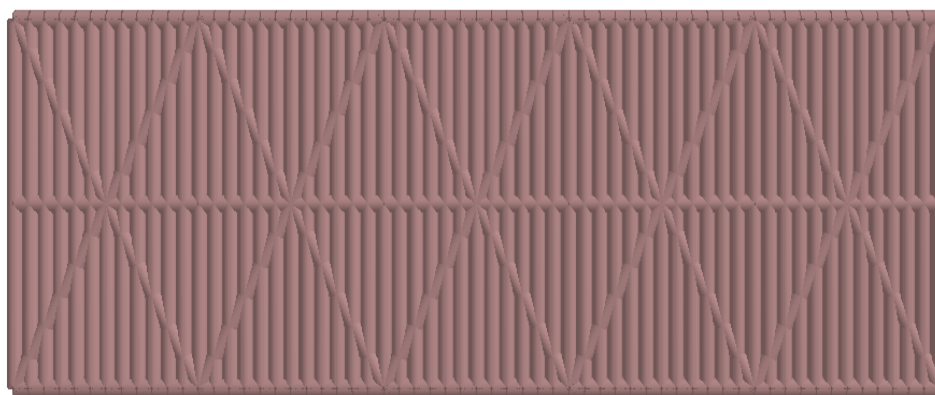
Deck of Pedestrian bridge made up of Bamboo with stiffener and cross stiffener -Case 6 (BC6)
